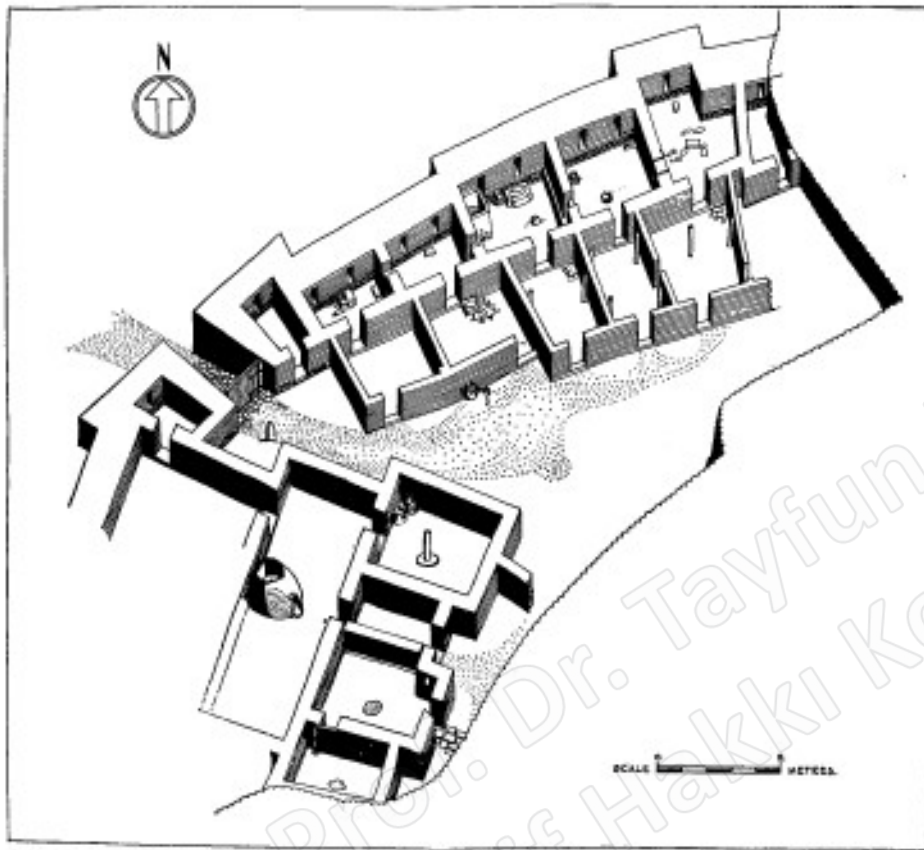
ELEVATION OF THE FORTIFICATIONS, BARRACK ROOMS, AND RESIDENCE.
